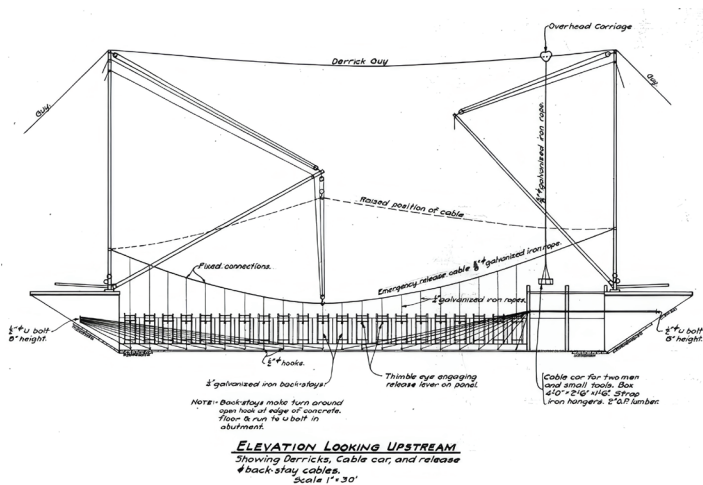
Historic Coyote Percolation Dam elevation plan showing key features of the dam from a similar perspective as the historic photograph above. Fred H. Tibbetts, Santa Clara Valley Water Conservation District: Coyote Percolation Dam, South of San Jose, California, File No. 1933-21, August 1933 (on file at Valley Water's archives).
